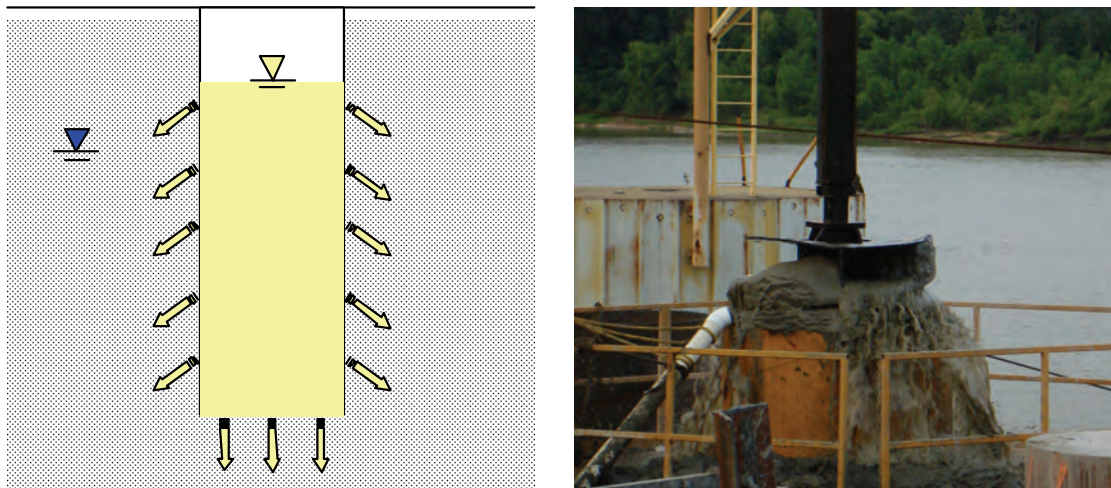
Slurry Provides Seepage Pressure against Excavation Surface
